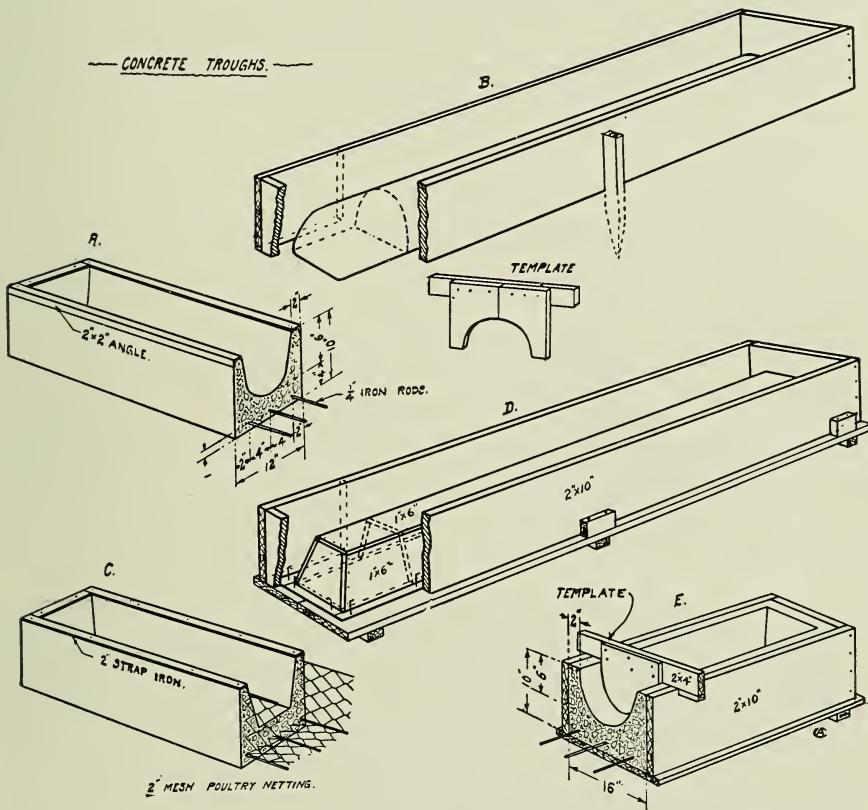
Concrete Troughs suitable for use in concrete hog houses.
